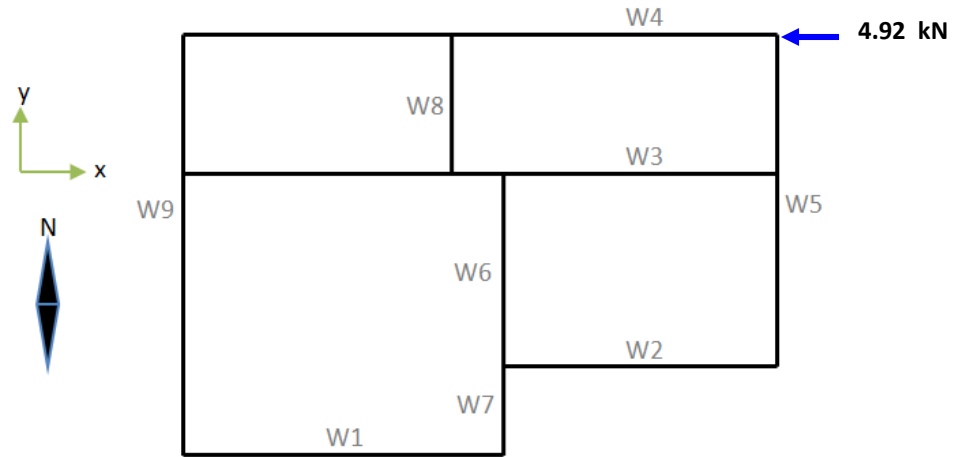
Load Case 5 – 4.92 kN Applied to Top-Plate at Wall 4
